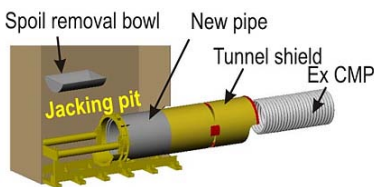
Replacement with jacking pipe (Tenbusch and Tenbusch, 2008)
